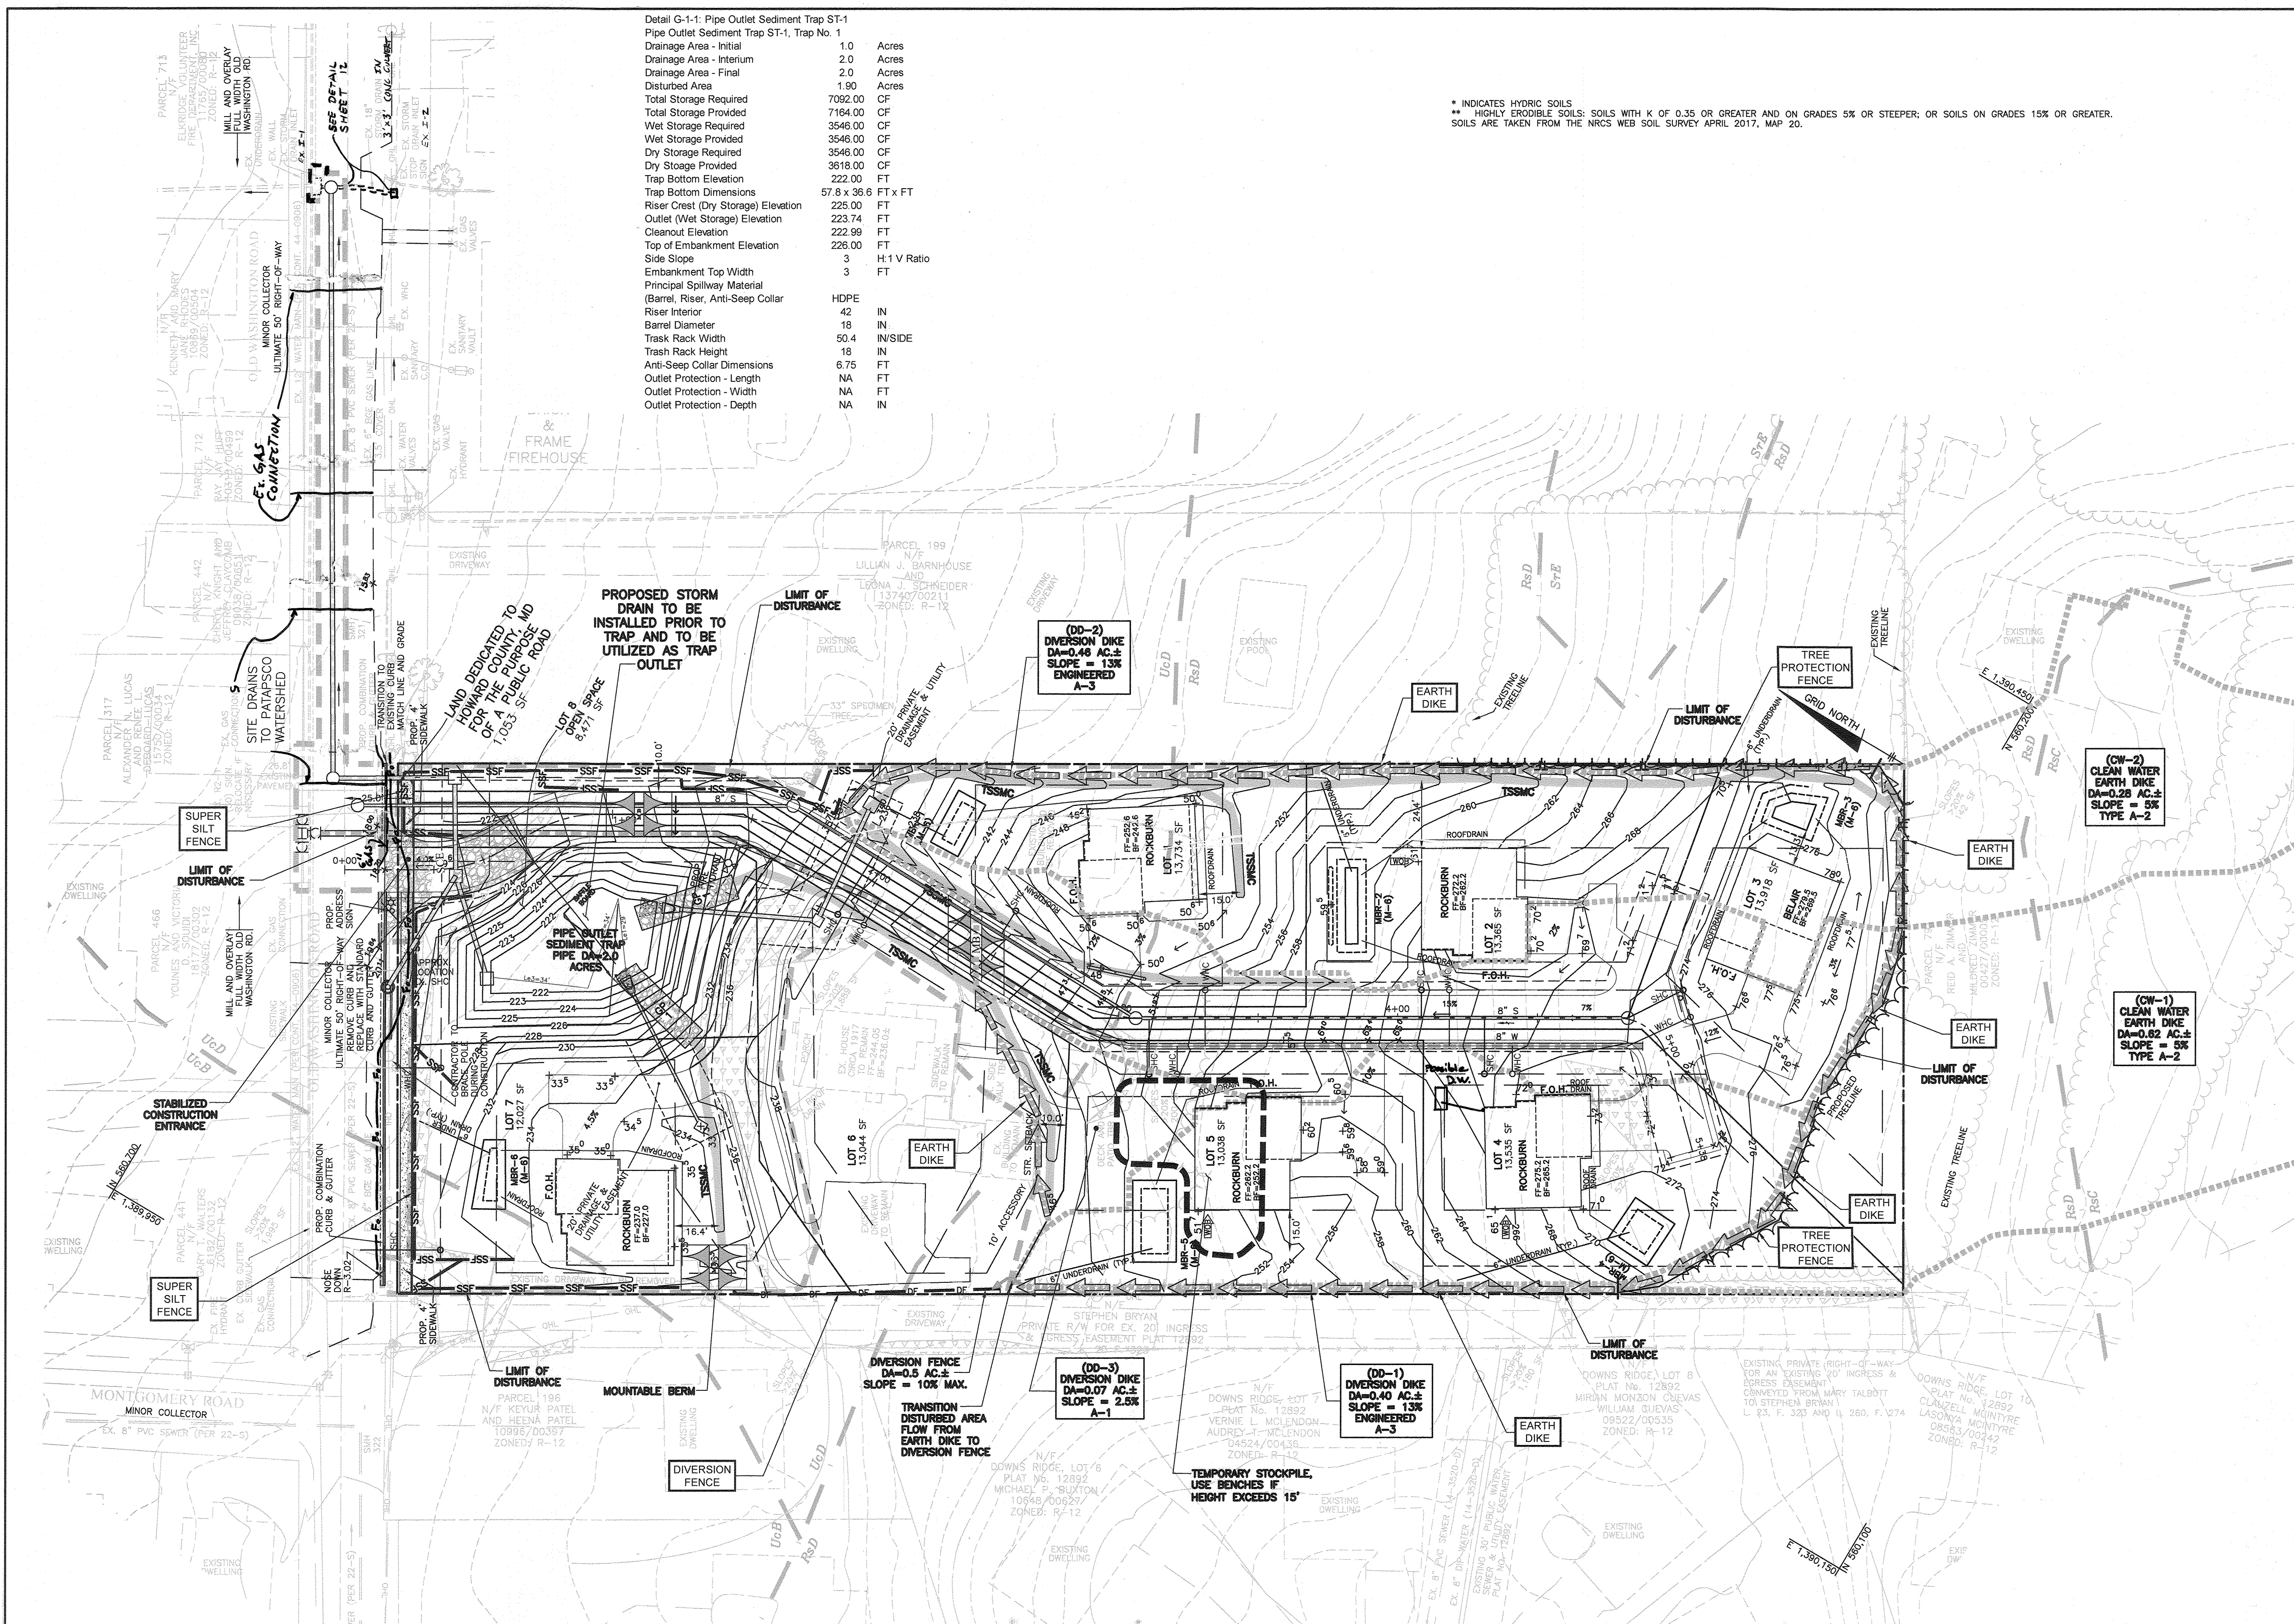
Pipe Outlet Sediment Trap ST-1
